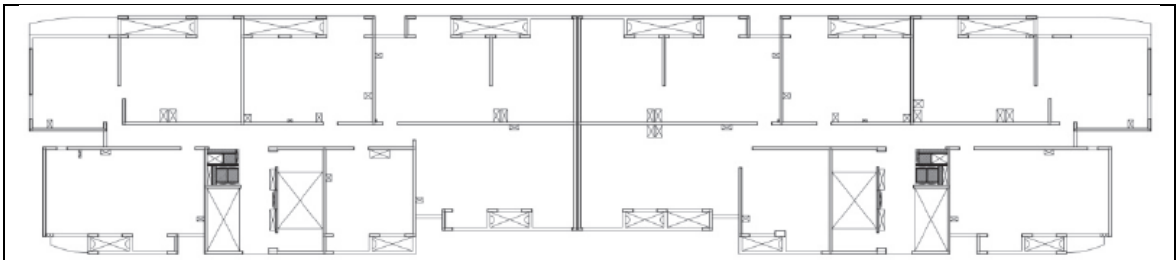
Example floor plan of a "fish-bone" Chilean residential building
